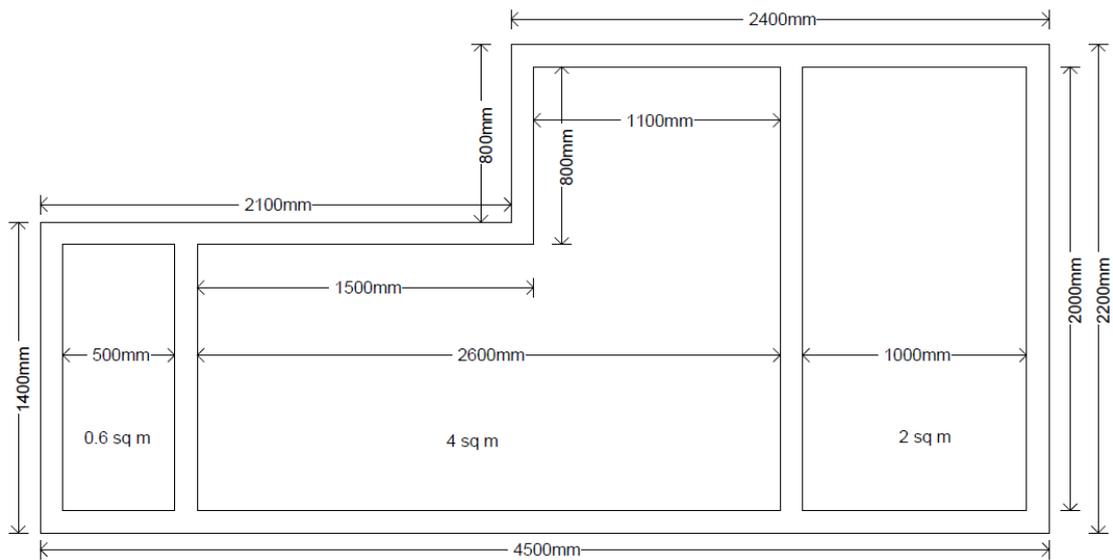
Our Construction Plan for The New Grease Trap Section (top view)
